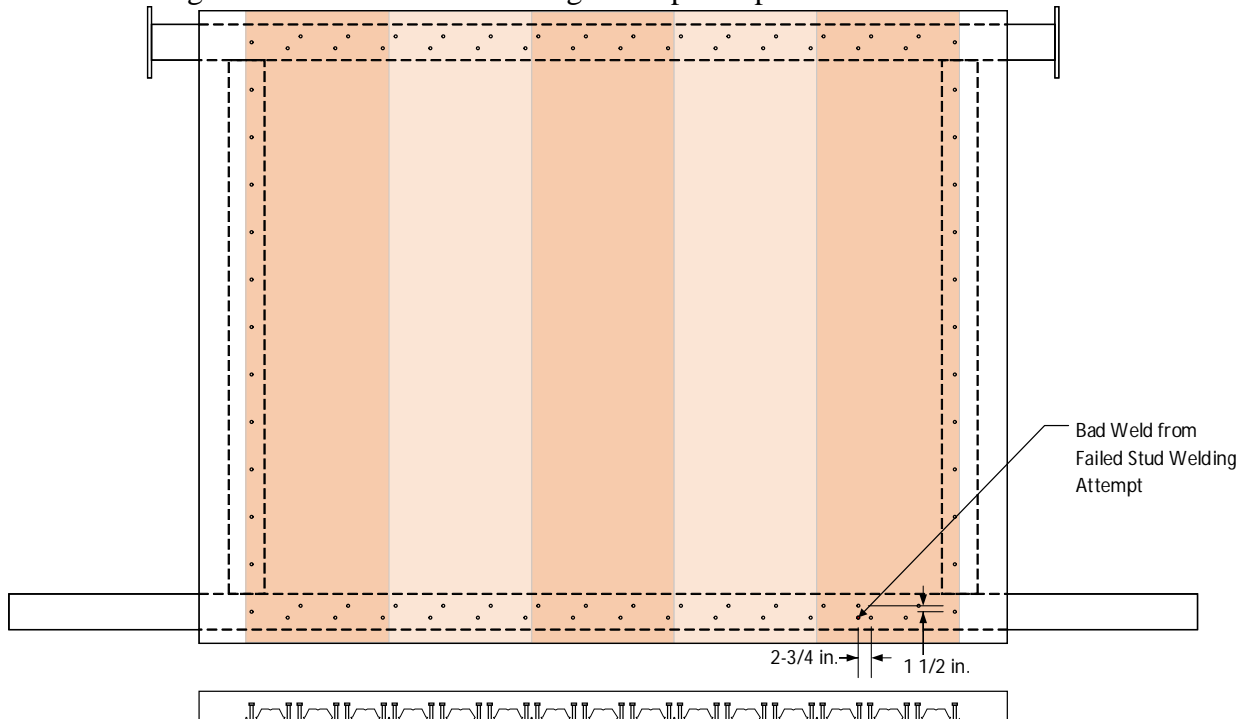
Location of Failed Stud Welding Attempt in Specimen 3/7.5-4-N-NF-DT
